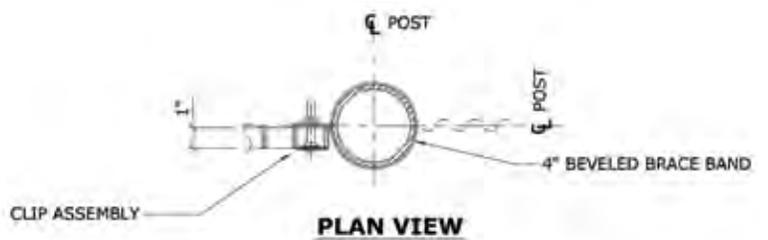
## DETAIL - CONNECTION TO STEEL 3"Ø POST
